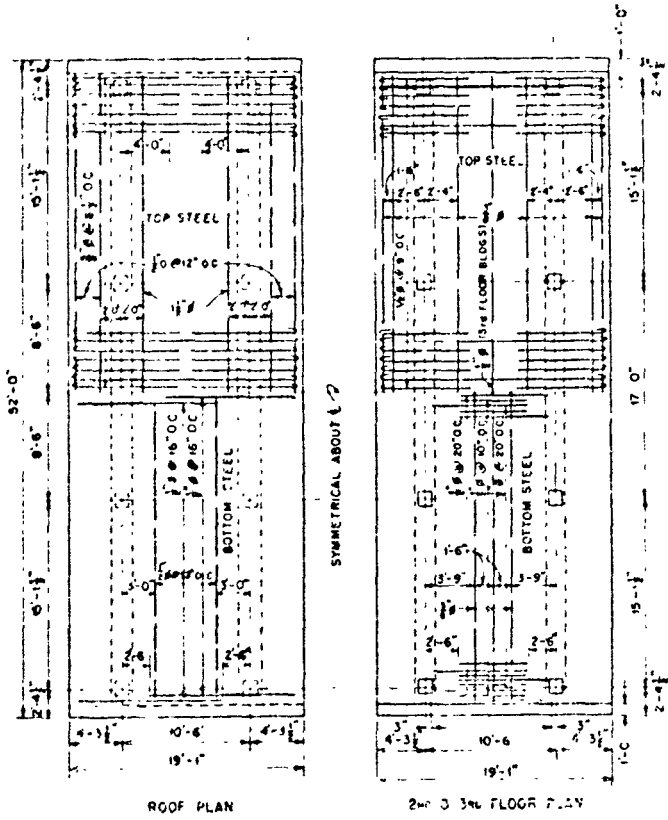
Second-floor, third-floor, and roof plans of Building 3.
